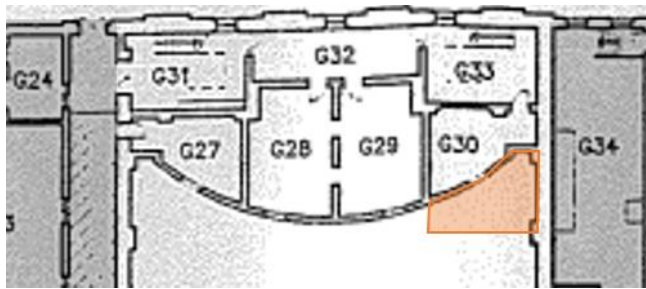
Highlighted area of floor plan with subfloor deterioration.
